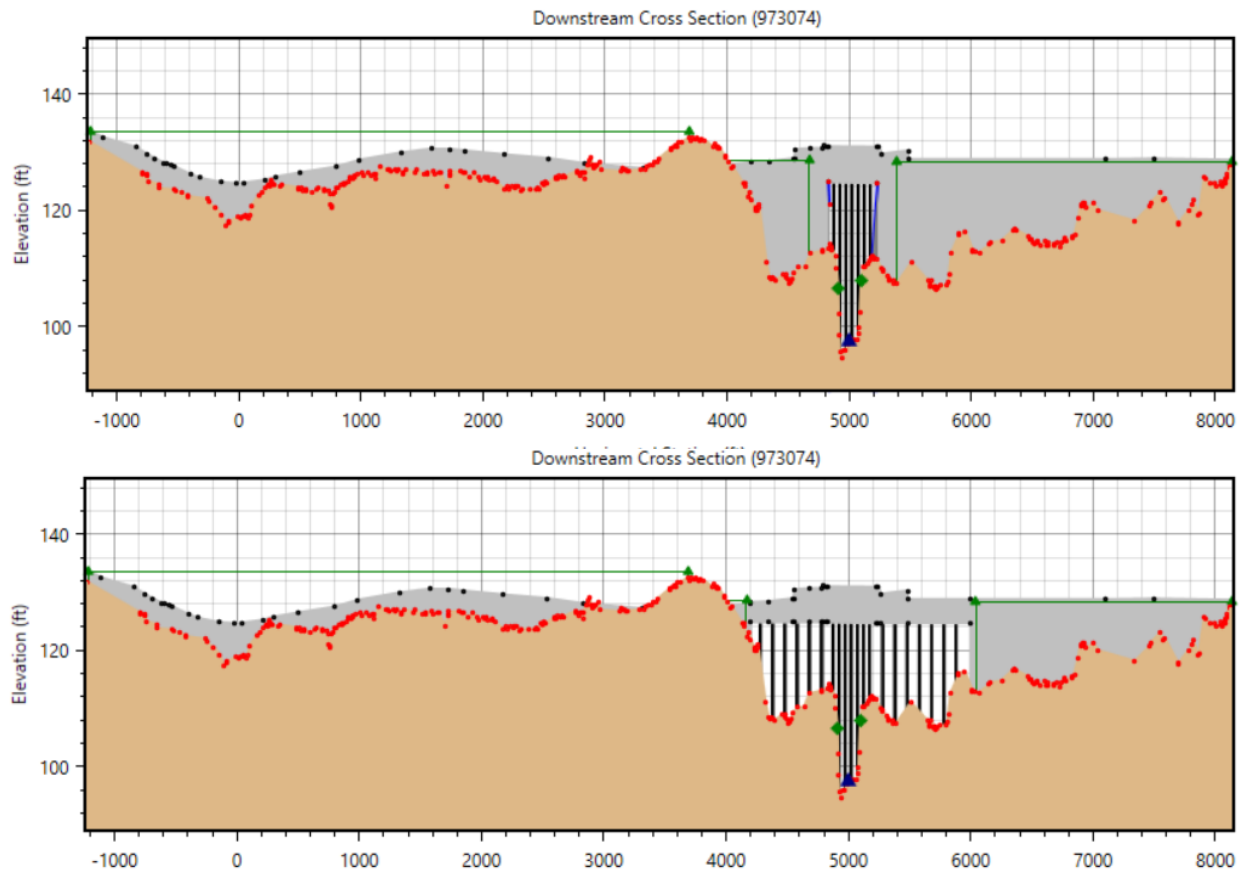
Existing (top) and modified (bottom) cross sections for I-95 bridge crossing (looking downstream). The modified cross section shows the part of the embankment removed, extension of the bridge deck, and additional piers.
